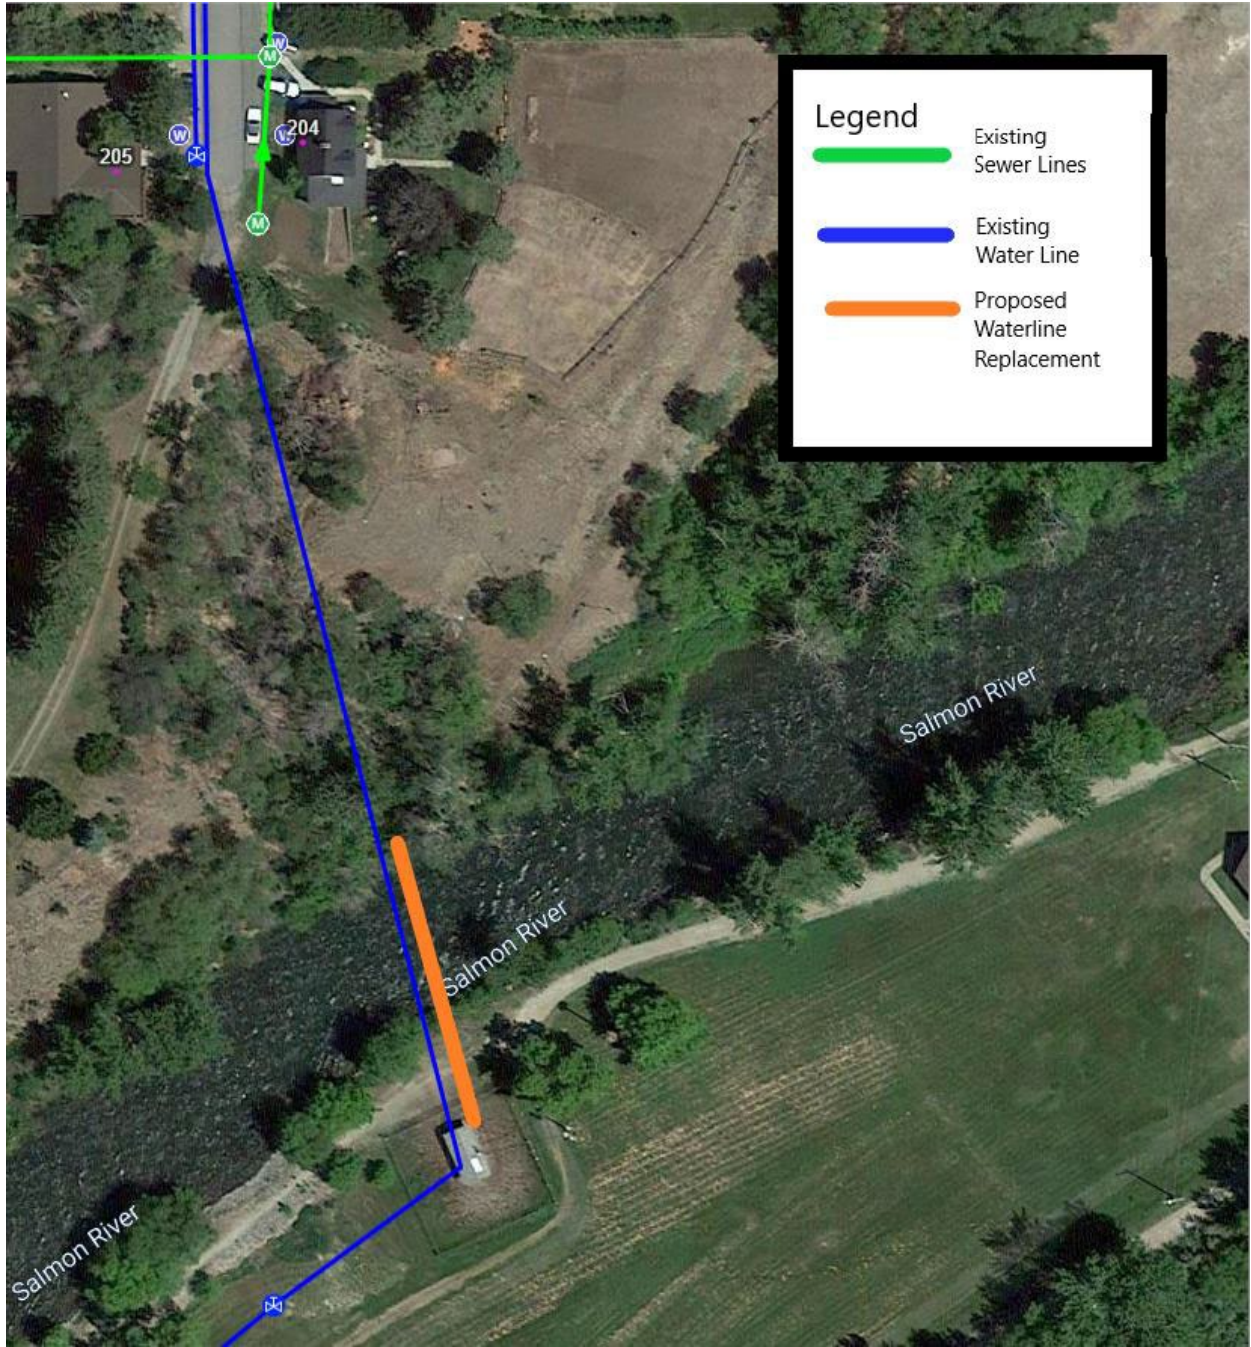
Location of the proposed Island Park pump station pipeline in the west channel of the Salmon River and the park access road to the site (USACE 2023).
